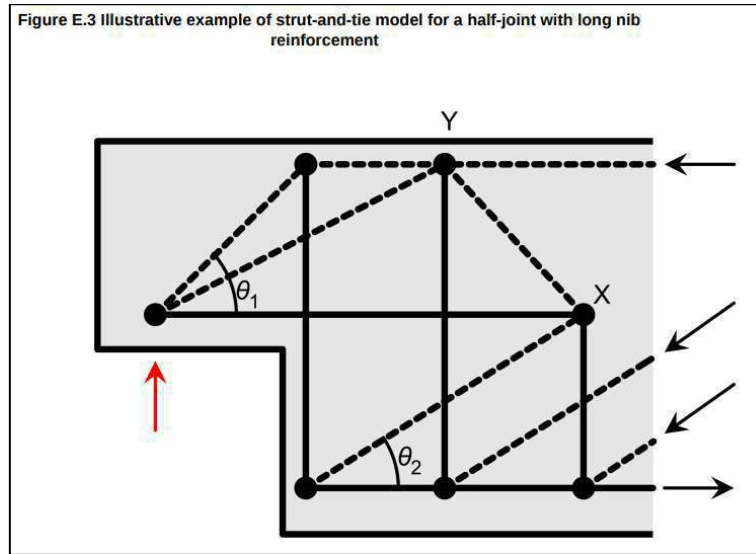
of CS 466 showing idealised strut and tie model, assuming longitudinal reinforcement is as shown on record drawings).
